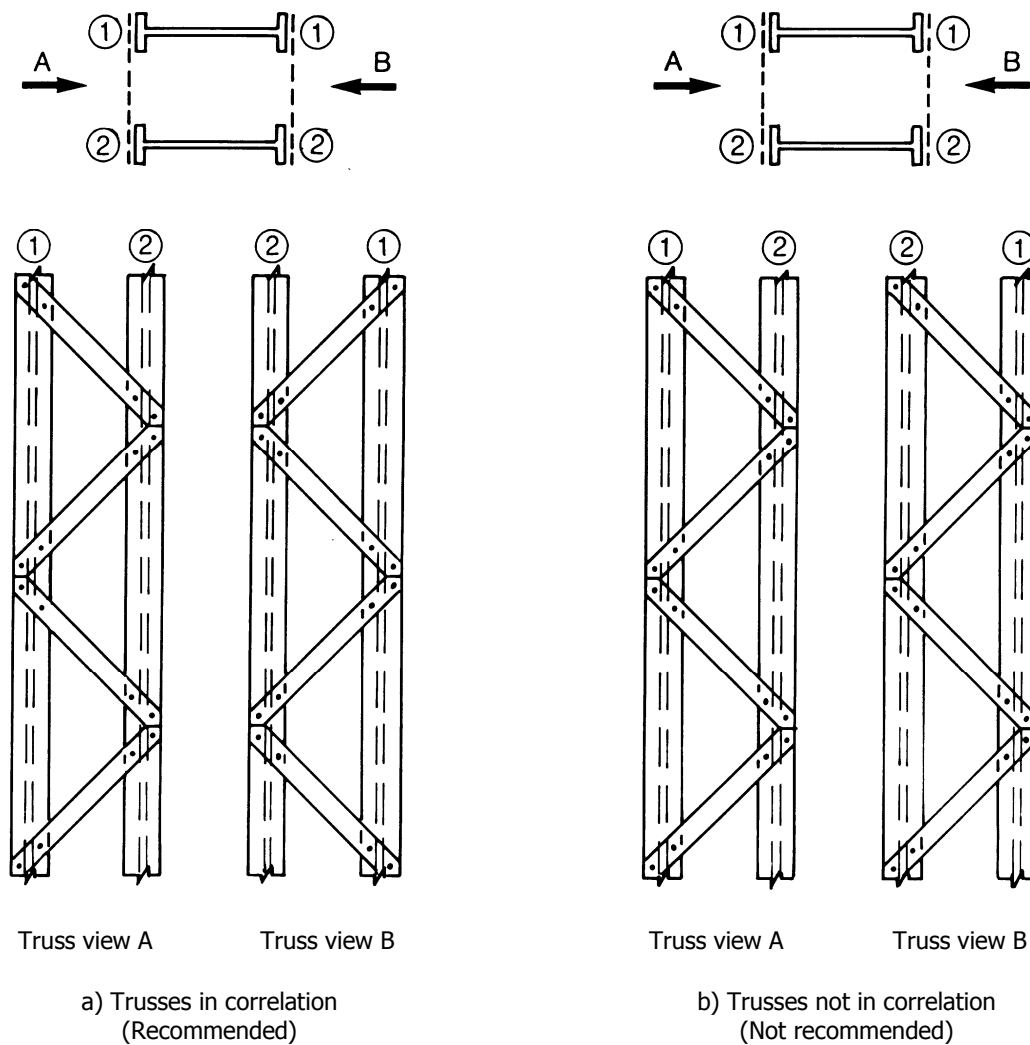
(a) Recommended and (b) unacceptable arrangement of lacing bars in parallel planes [2-24]
